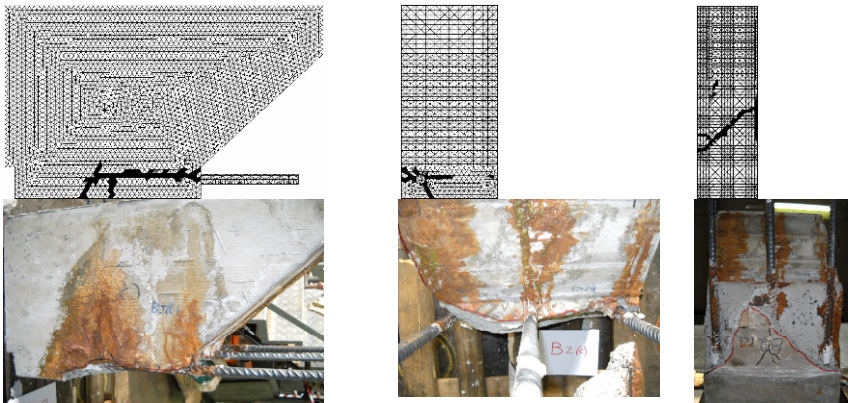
Crack pattern: corroded specimen Type B, corner bars test
